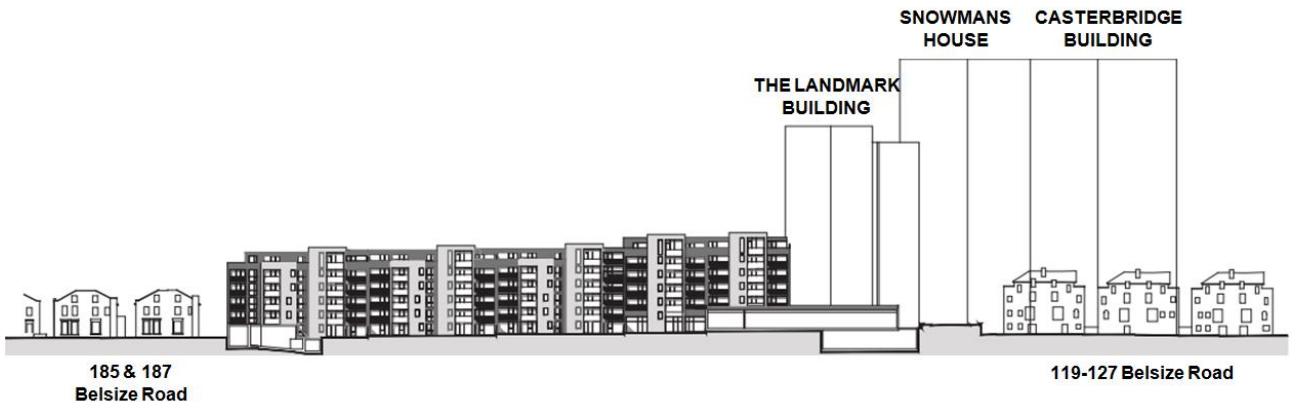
Elevation view of Abbey road Phase 1 regeneration with surrounding houses, Snowman house and the Casterbridge building superimposed.
